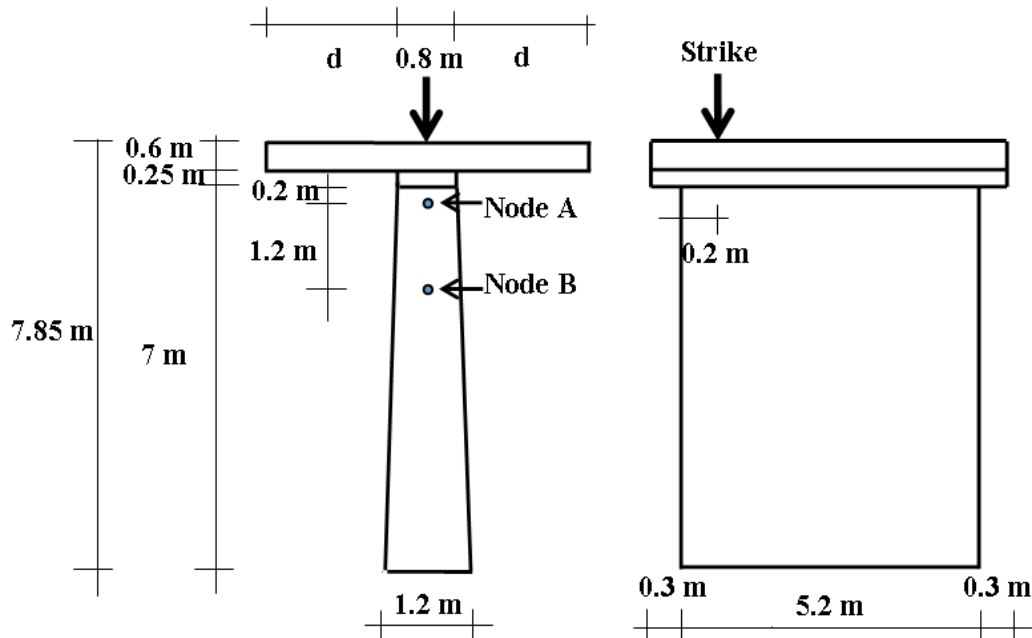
Cross Section and Side View of the Models with Bridge Deck
